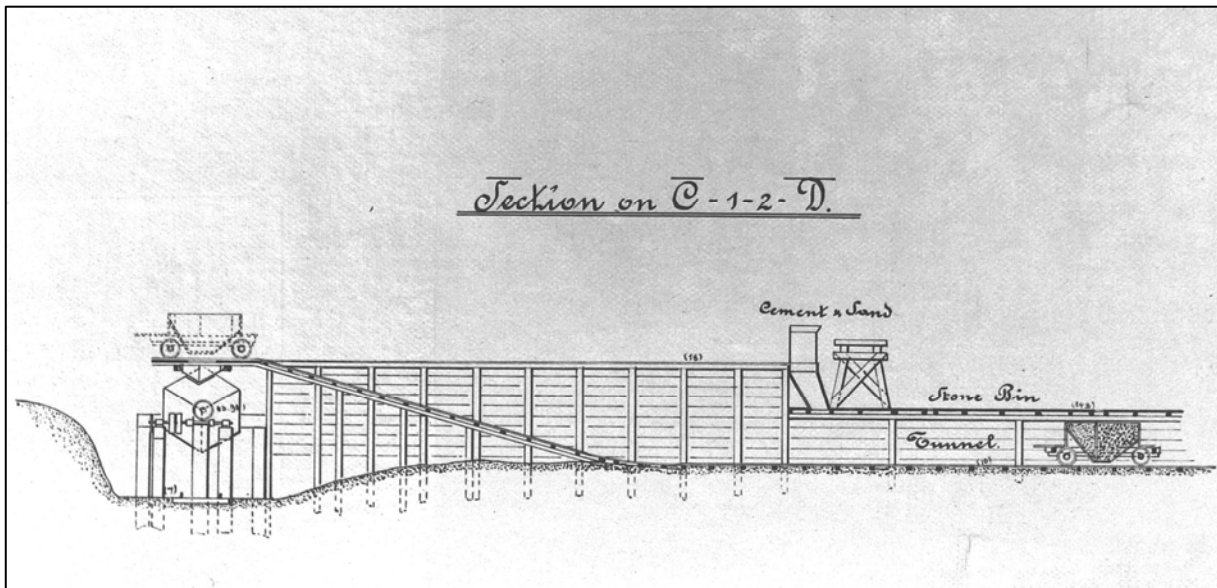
"Gun Lift Battery No. 1, at Sandy Hook, N. J." Detail of concrete plant section. Prepared under the direction of 1st Lt. J.G. Warren, June 30, 1892.
